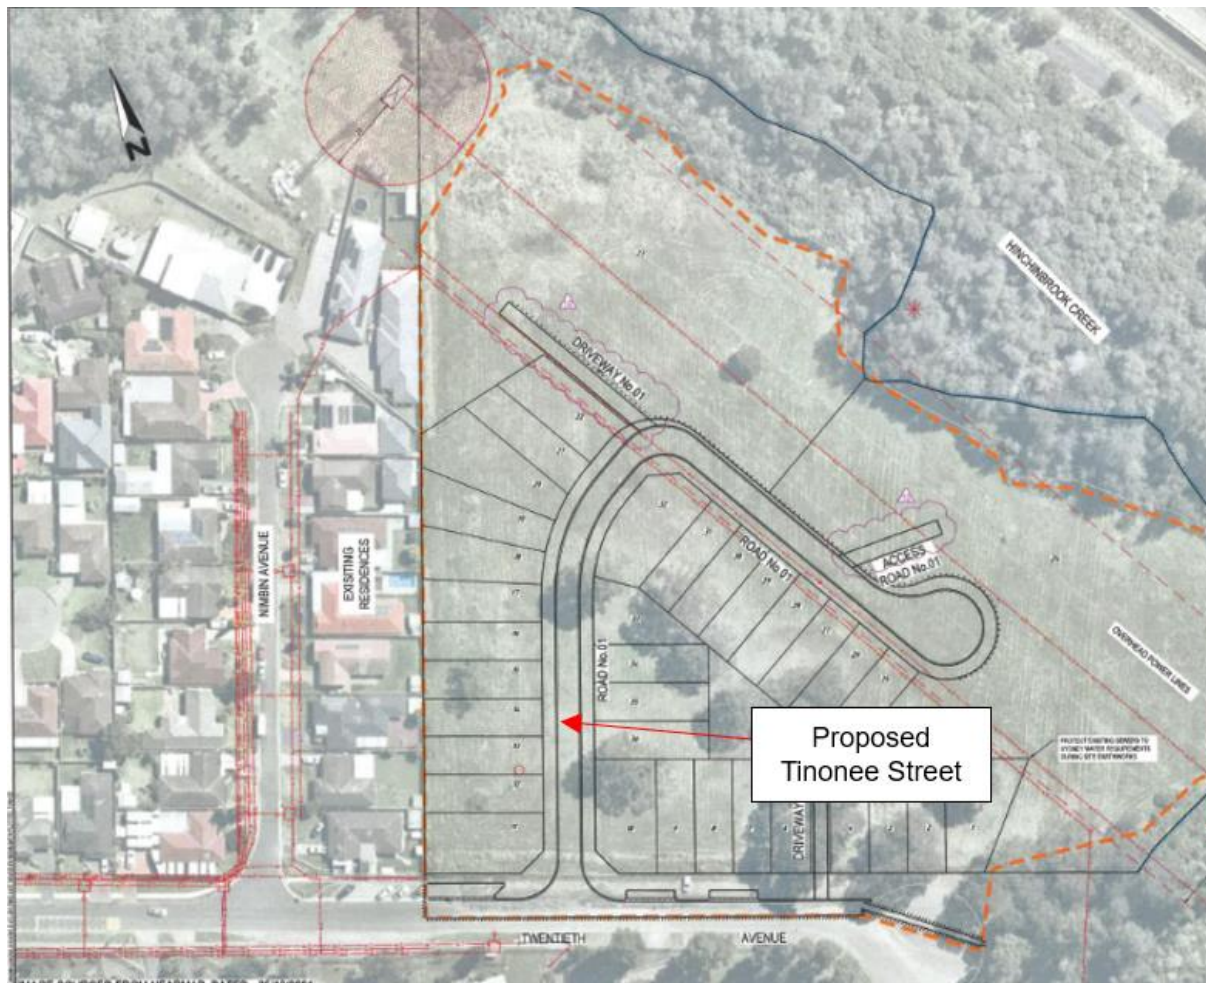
Subdivision plan showing location of proposed Tinonee Street
